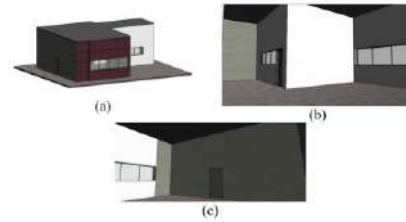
(a) Allocated materials to outside walls (brick cladding, concrete block, dry wall system)- (b) and (c) Allocated materials to inside walls and floor (dry wall system, concrete block, and carpet)
